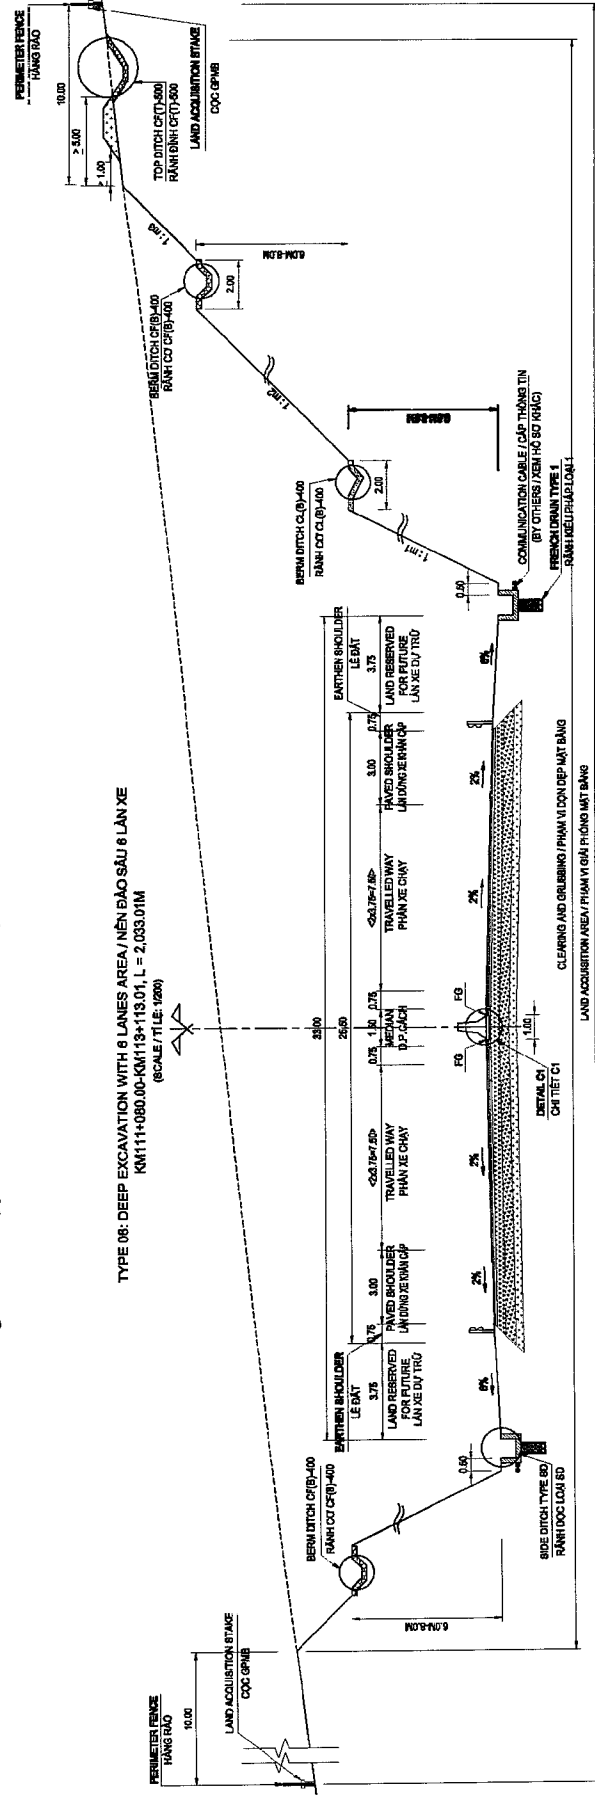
Typical Cross Section of Expressway at Deep Excavation
